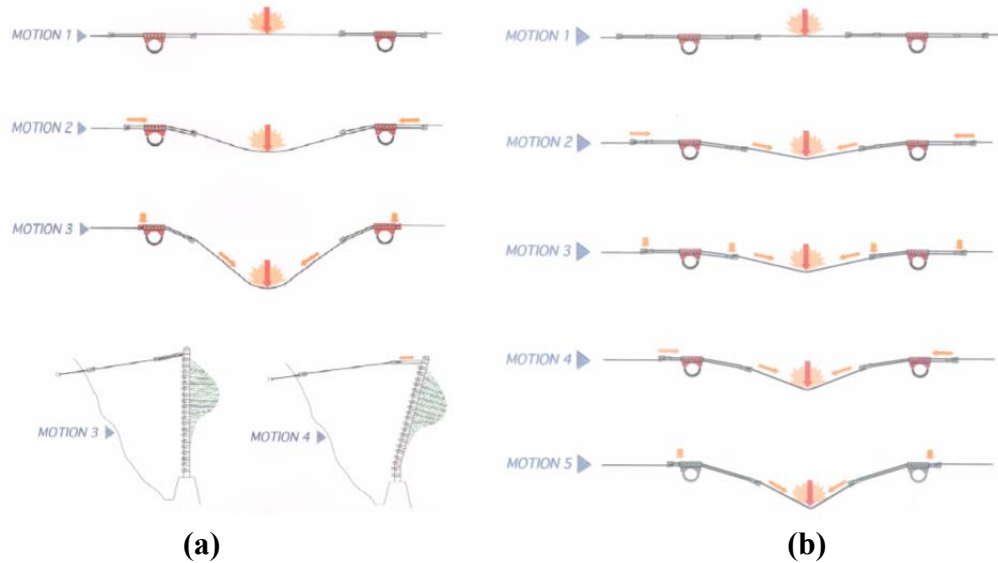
Behavior of HERF system under impact of rock fall (boulder): (a) boulder colliding with upper cables and (b) boulder colliding with lower cables.
